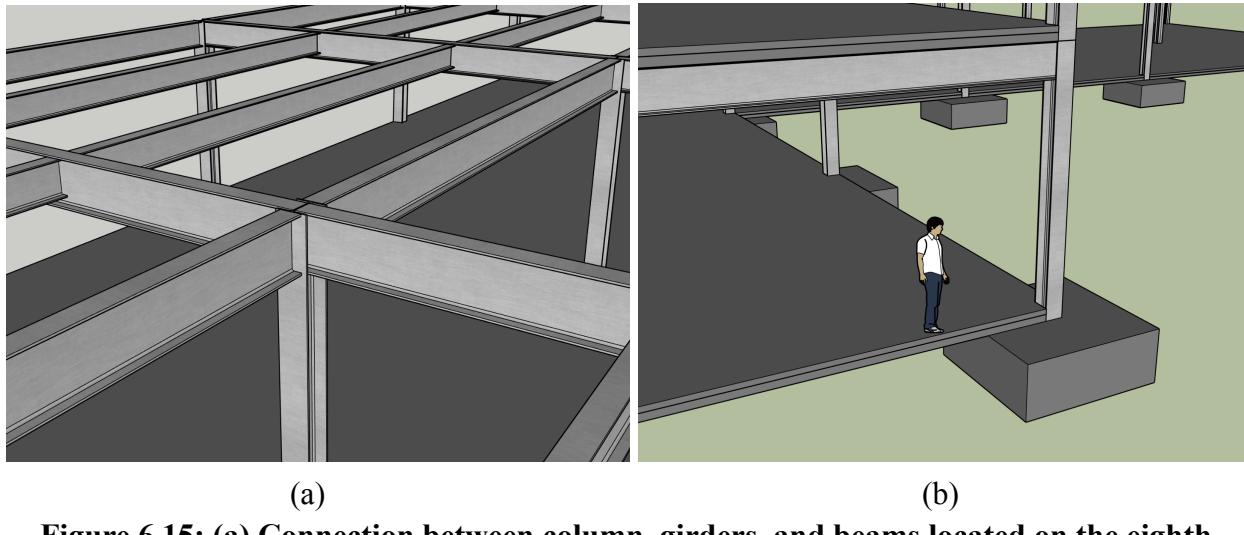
(a) Connection between column, girders, and beams located on the eighth floor. (b) Concrete foundation located on an outer corner.
